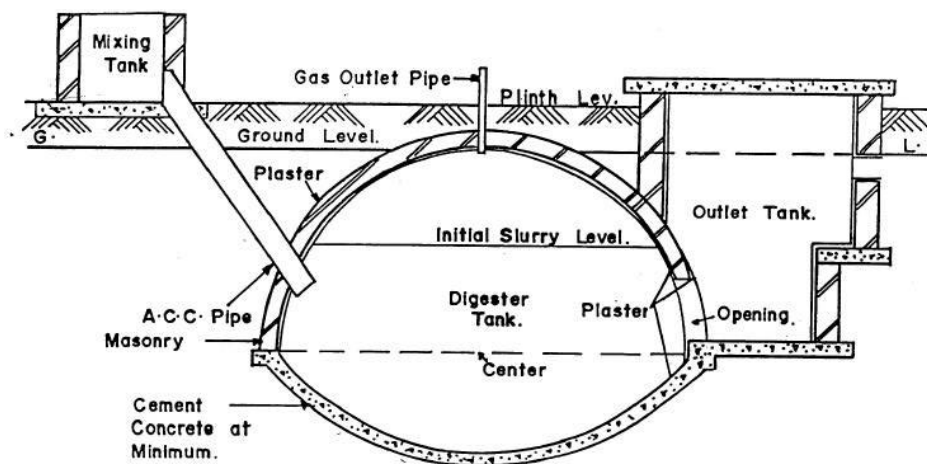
GGC CONCRETE MODEL BIOGAS PLANT
